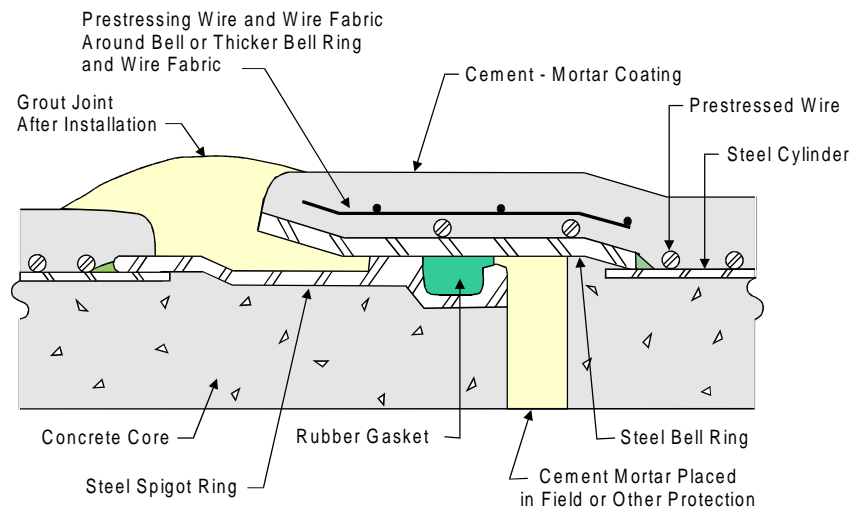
Prestressed Concrete Cylinder Pipe with the Prestressing Wire Wrapped around the Steel Cylinder
